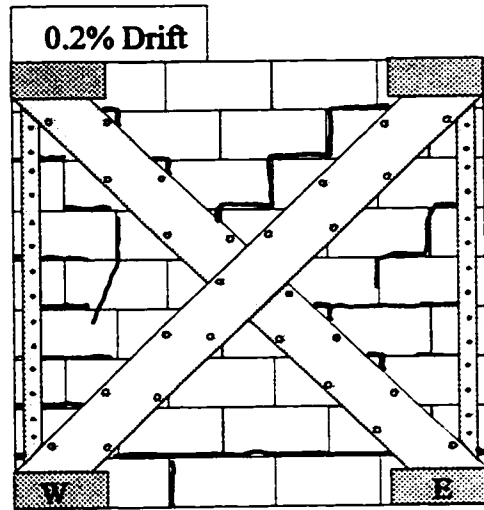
Cracking width for Wall 9 at lower drifts
